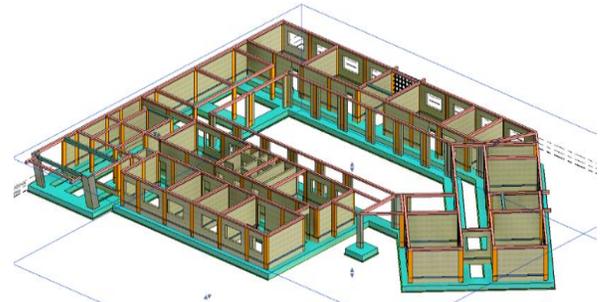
Construction of ground floor walls (sustainable or unsustainable)
